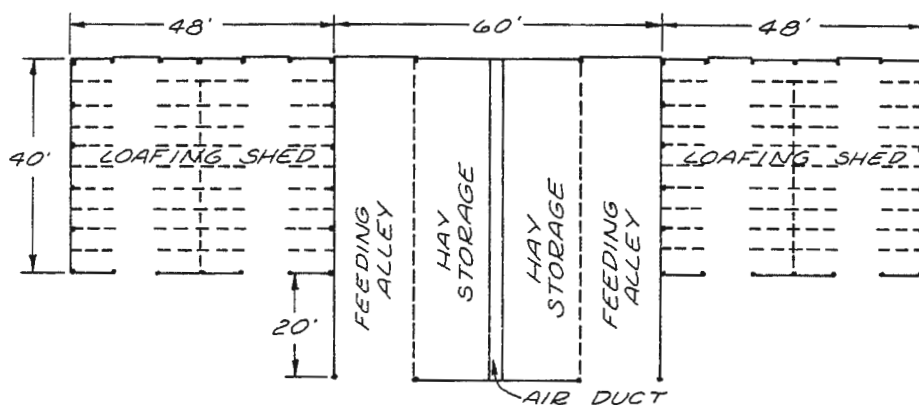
Top view of chopped hay storage structure and adjoining loafing sheds
